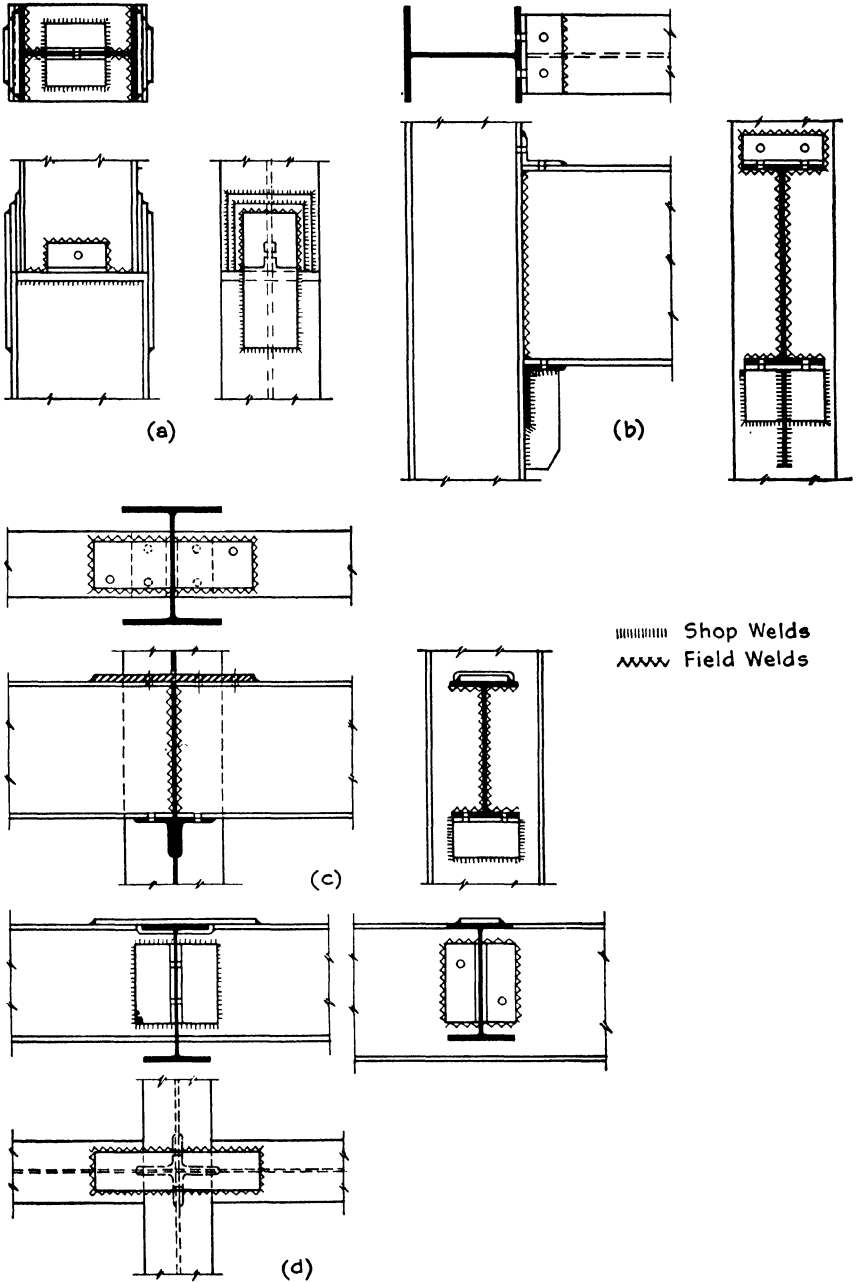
Welded Structural Steel Connections. (a) column splice; (b) beam framing into column flange; (c) opposite beams framing into column web; (d) opposite beams framing into girder.
